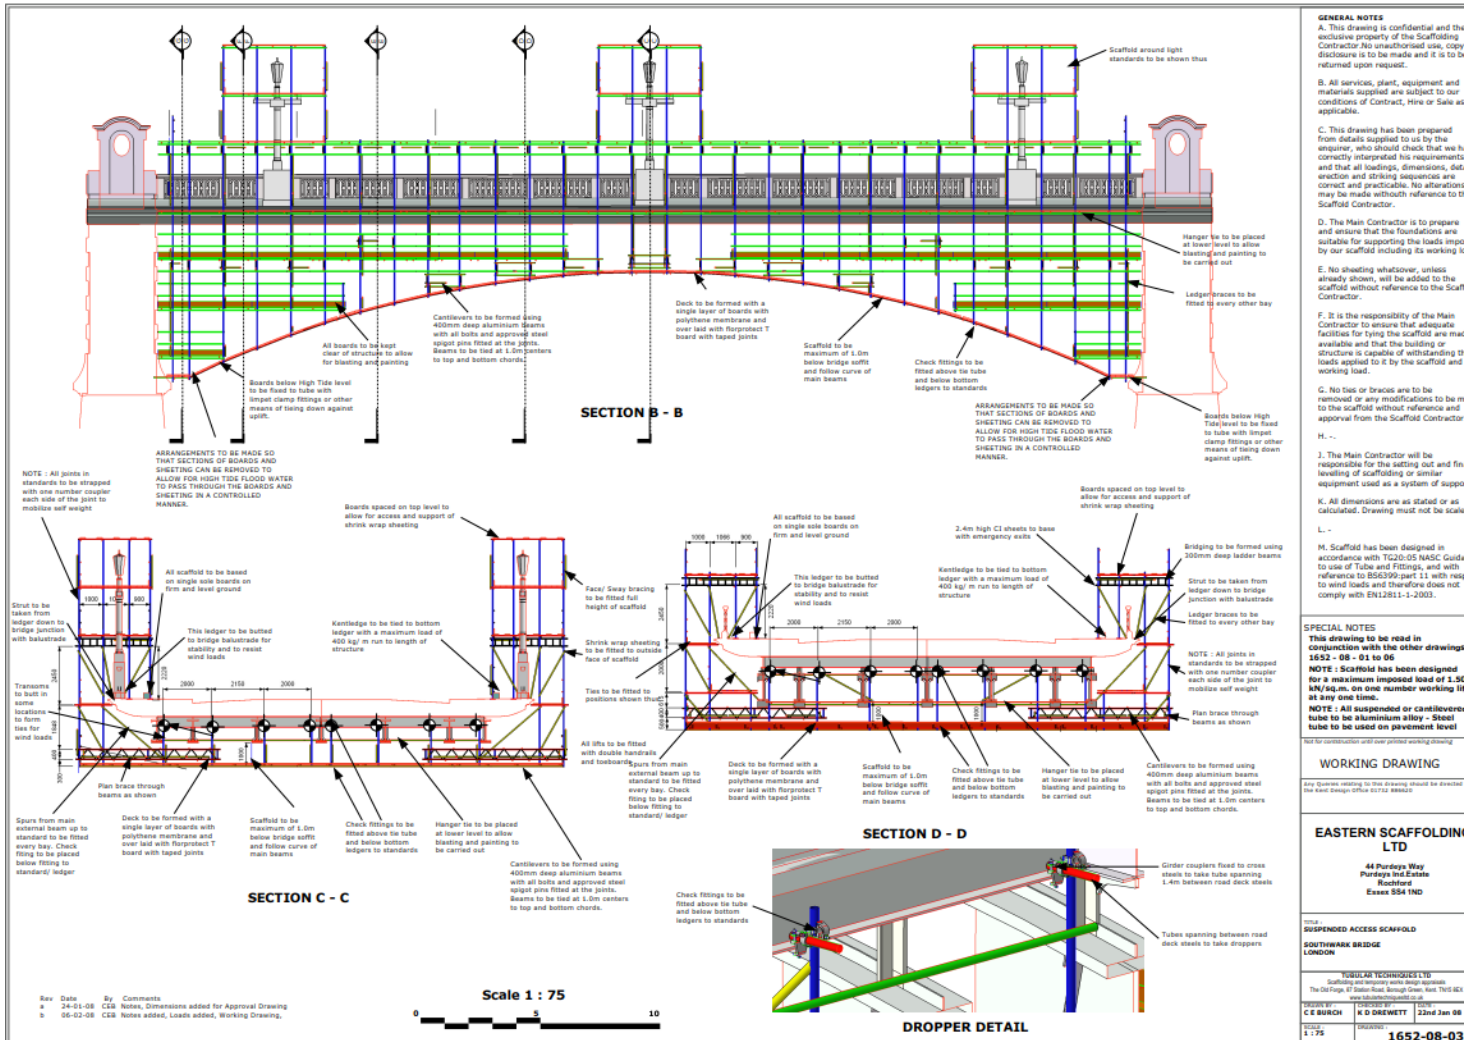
Scaffolding used on Southwark Bridge [3/6]
